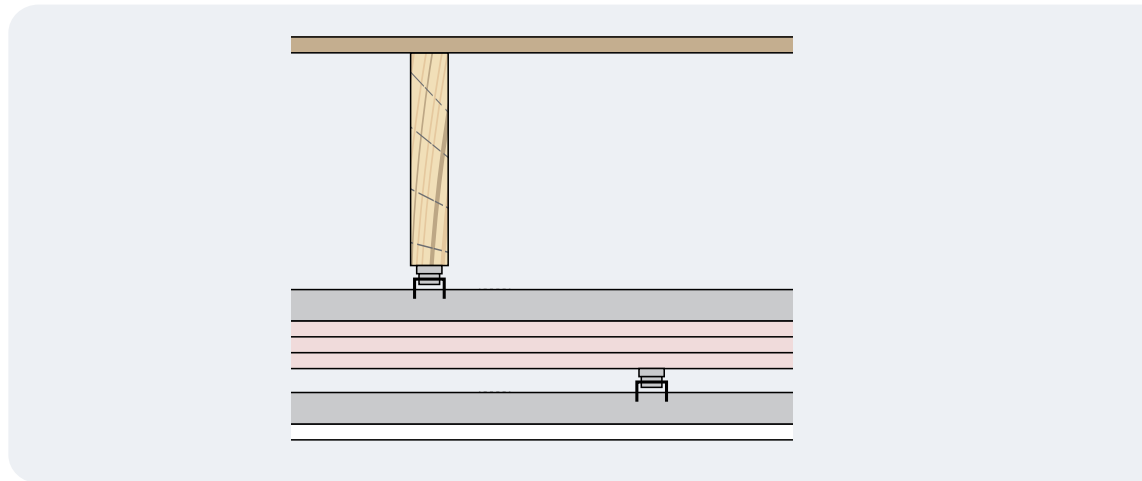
False ceiling detail for minimising service penetrations through ceiling systems.
